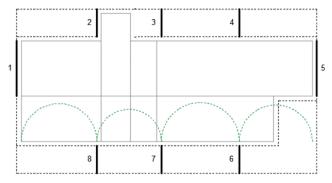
Distribution of the additional walls to reduce the diaphragm's overload (in the RC wall solution the walls 1 and 5 on the façade are split in two walls).
